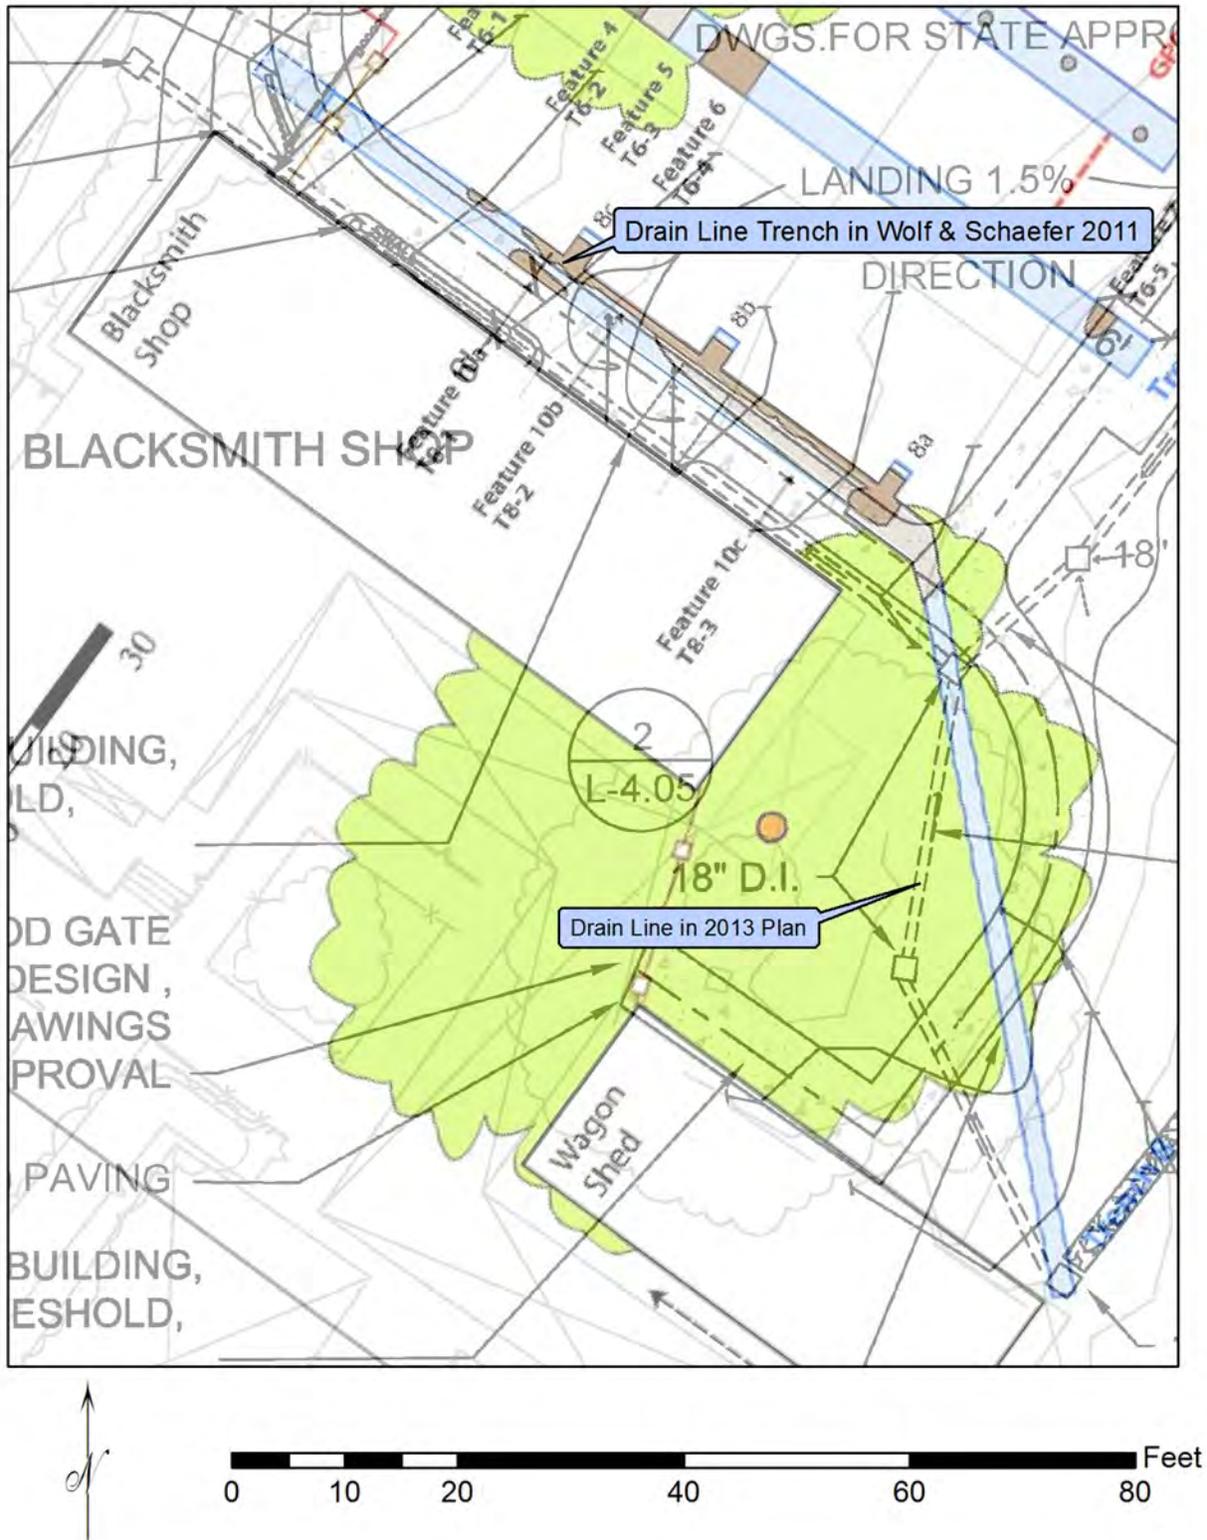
Wolf and Schaefer plan view and 2013 project plans, showing drain line trench.
